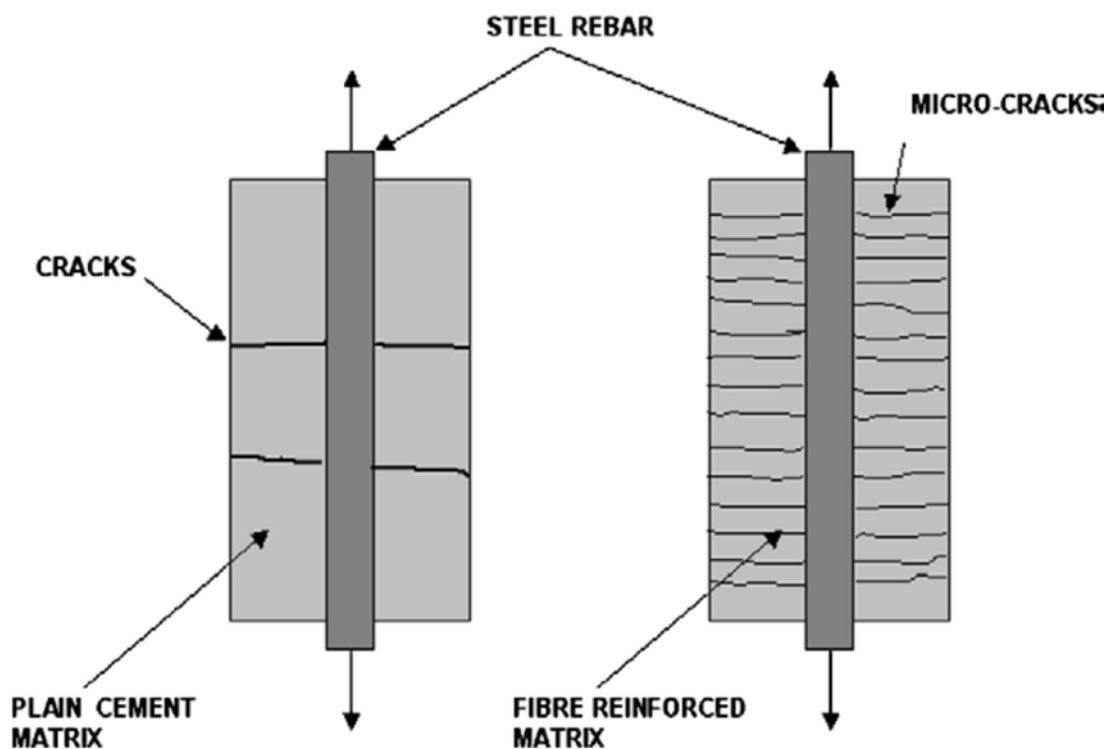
Crack patterns in reinforced concrete (RC) and fibre reinforced concrete (FRC) elements subjected to tension (Brandt 2008).
